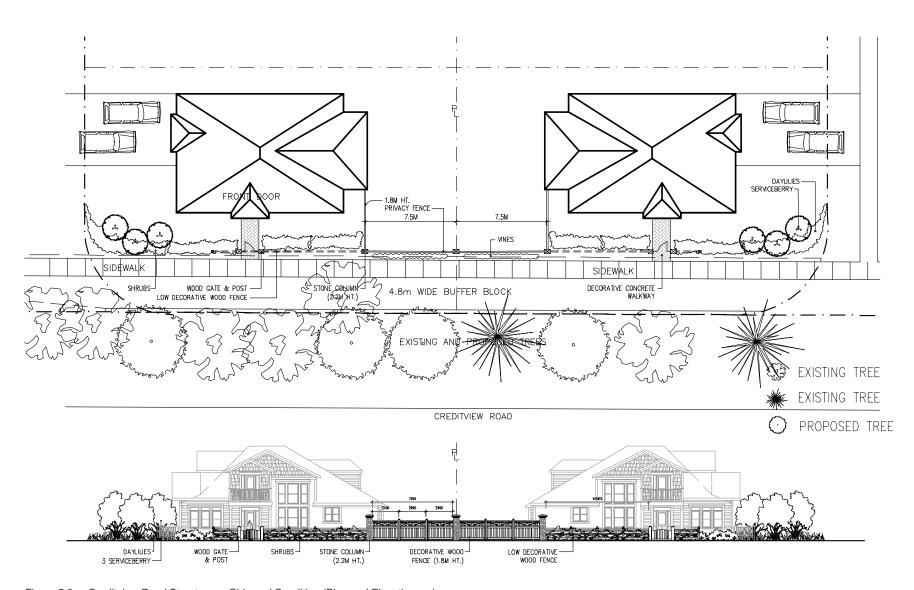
Creditview Road Streetscape Sideyard Condition (Plan and Elevation c-c)
